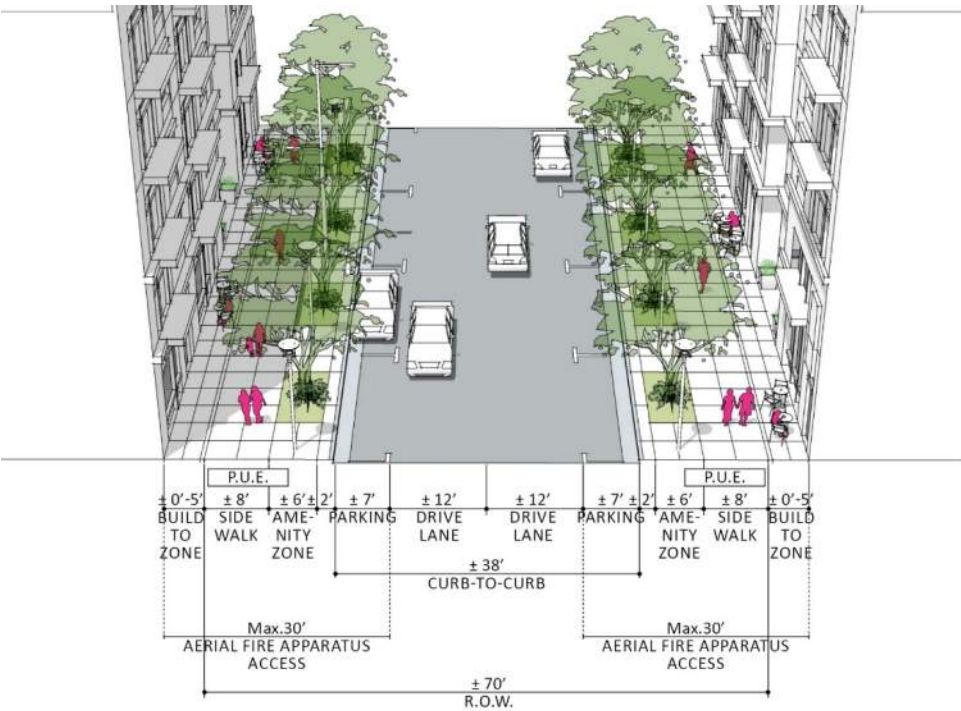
Mixed-Use Street 1: adjacent to Commercial Ground Floor Use with fire access
